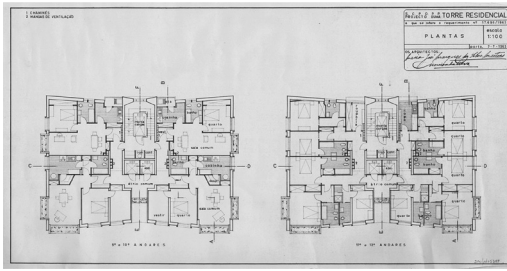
Miradouro Building plans, 9–10 floors—apartments and 11–12 floors—Inn (CMPorto et al., 1964).
